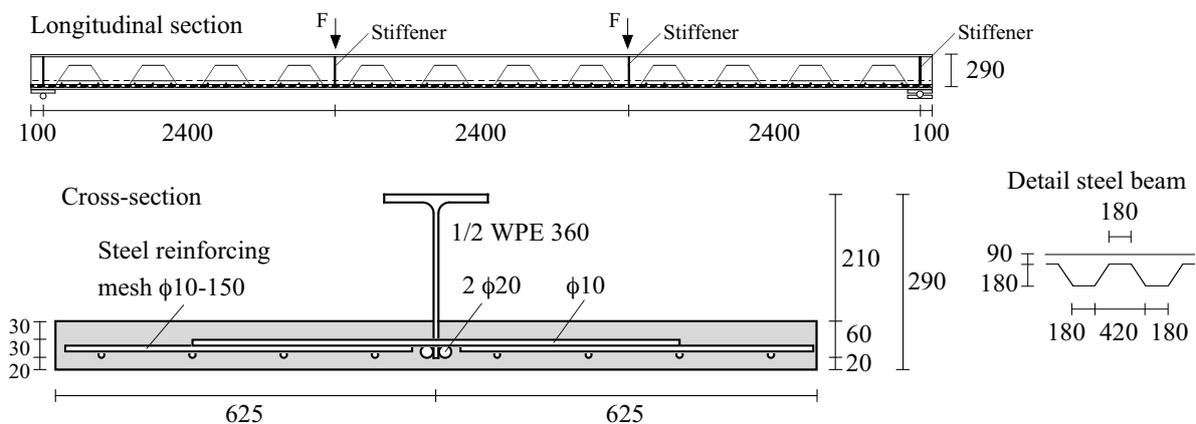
Steel-concrete composite beam with concrete slab on the bottom (“beam II”)
